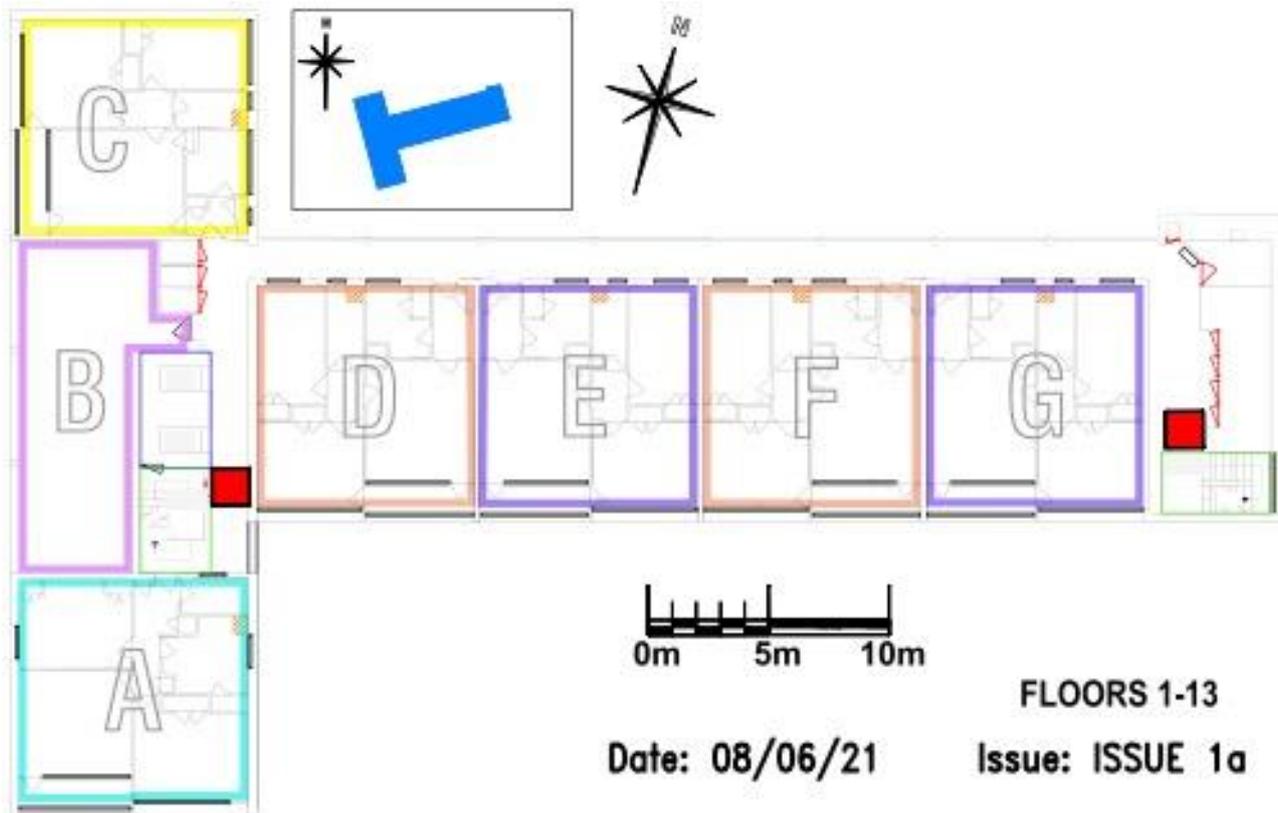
Typical Residential Floor Layout (Levels 1-14) original drawings⁵
